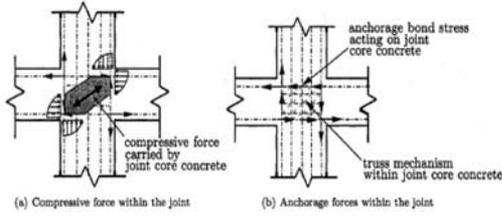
Strut and truss models proposed by Park and Paulay (1975) for interior beam-column joints.
